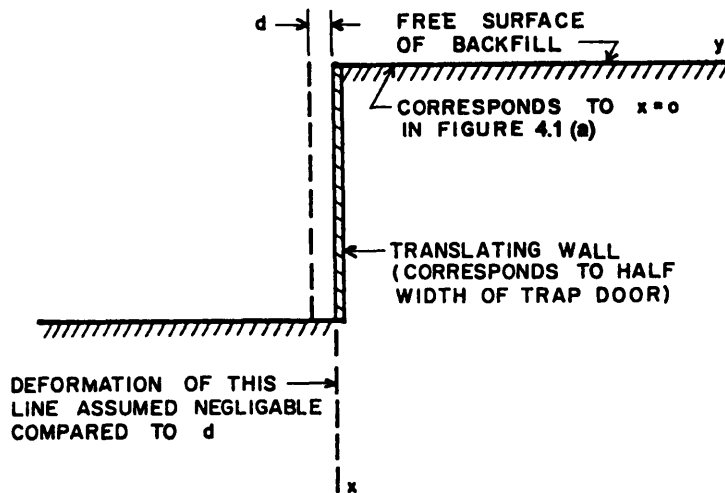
Translating Retaining Wall (Finn, 1963)
